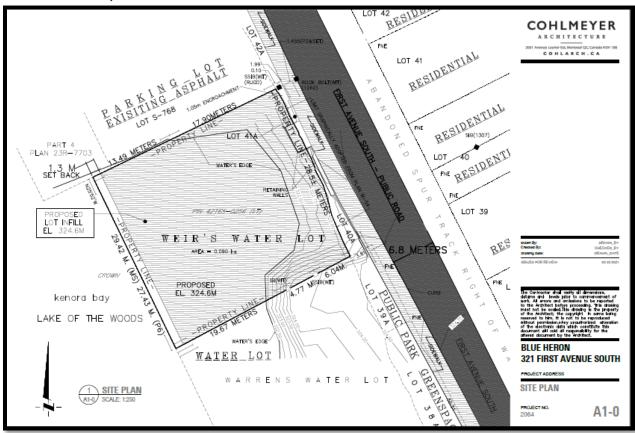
Site plan provided by agent, showing extend of proposed lot infill.
